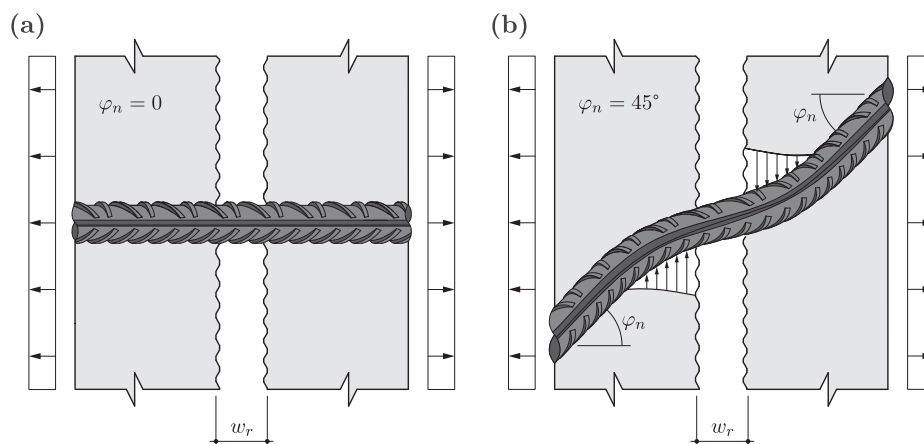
Reinforcing bar orientation relative to concrete cracks: (a) perpendicular to cracks; (b) inclined with respect to cracks, adapted from [20]. Note: the crack width is exaggerated.
